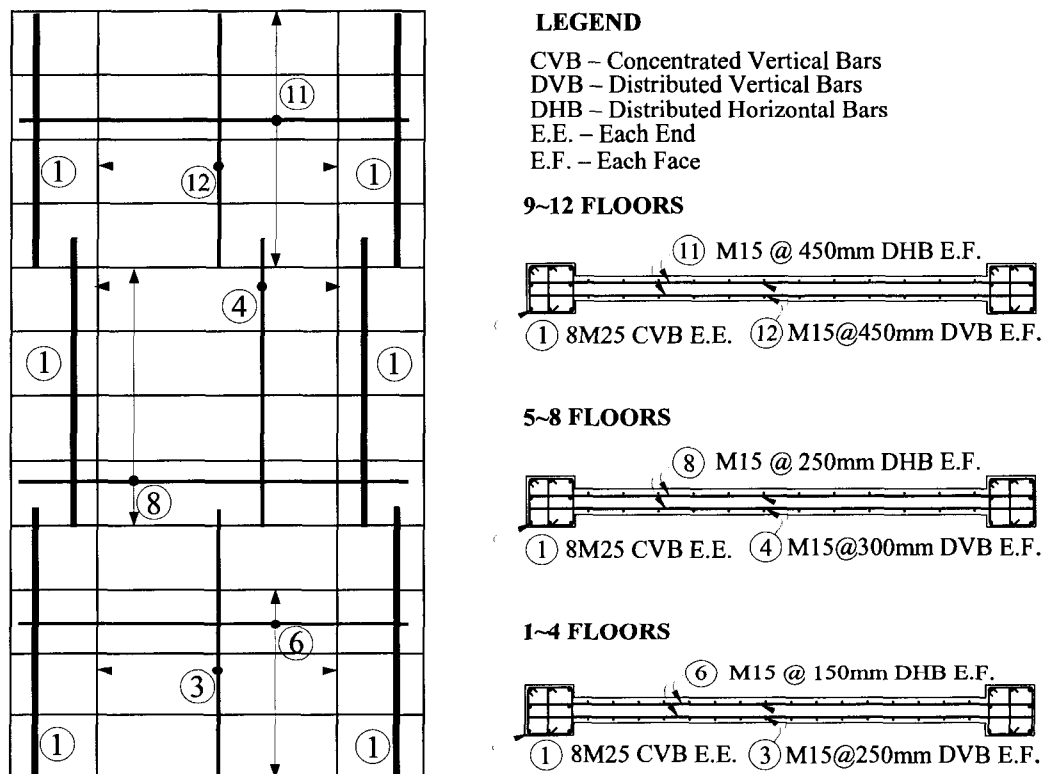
Shear wall reinforcement in B12 building located in Vancouver.
